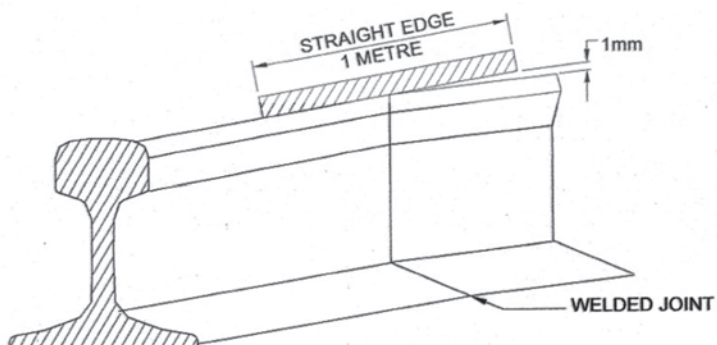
(e) Tolerance for Vertical Misalignment of High Welded Joint with Old Rails
